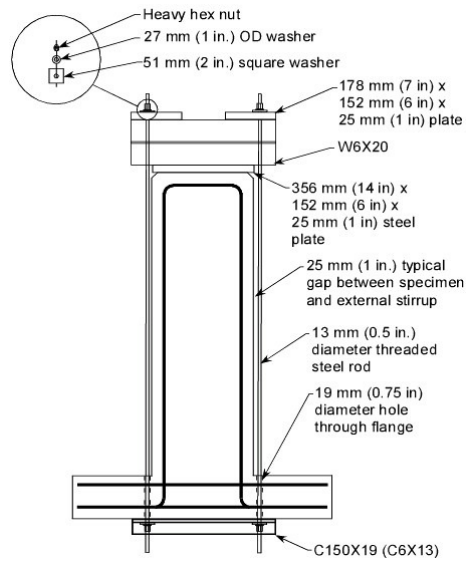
External stirrup typical section: strengthened WBeam repair.
